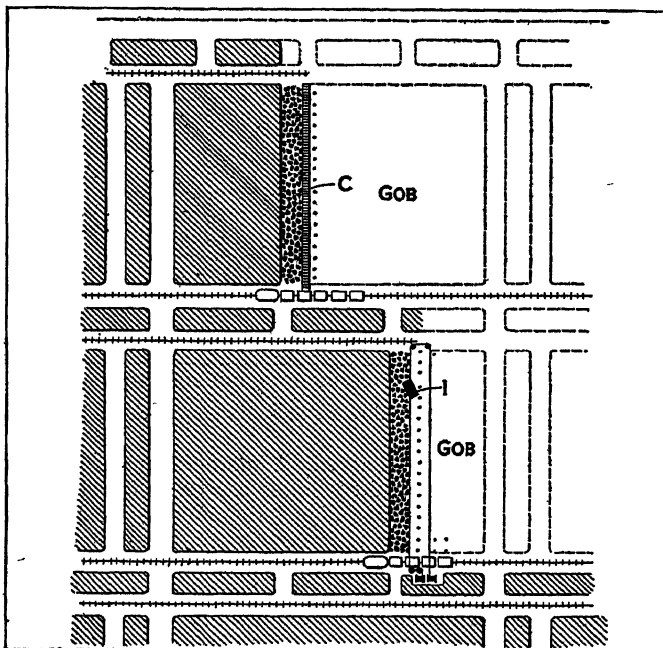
LONG FACE WITH CONVEYOR (C) OR SCRAPER (I)
